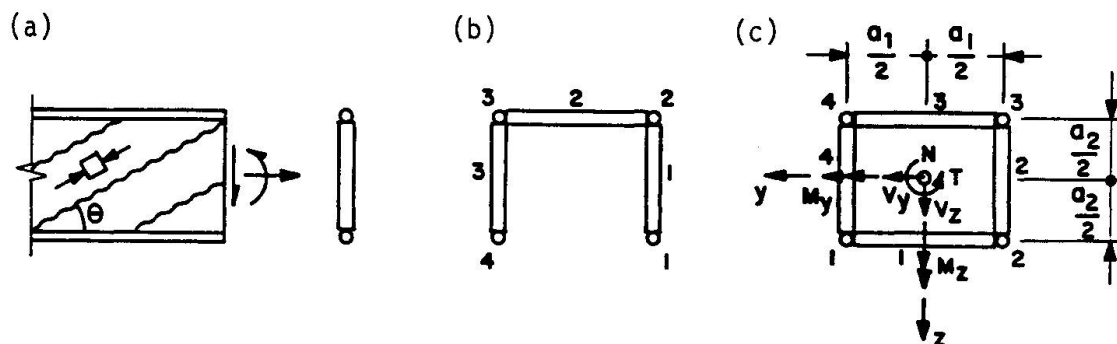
Subdividing a cross-section into wall and stringer elements: (a) Single web; (b) Open cross-section; (c) Box section.
